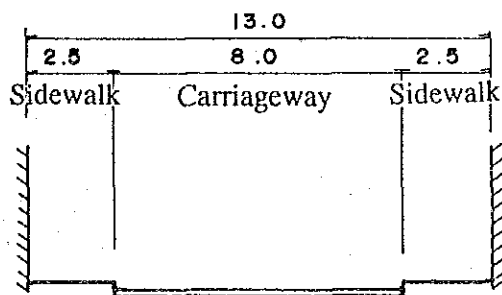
Typical Cross-Section of New Bagmati Bridge
